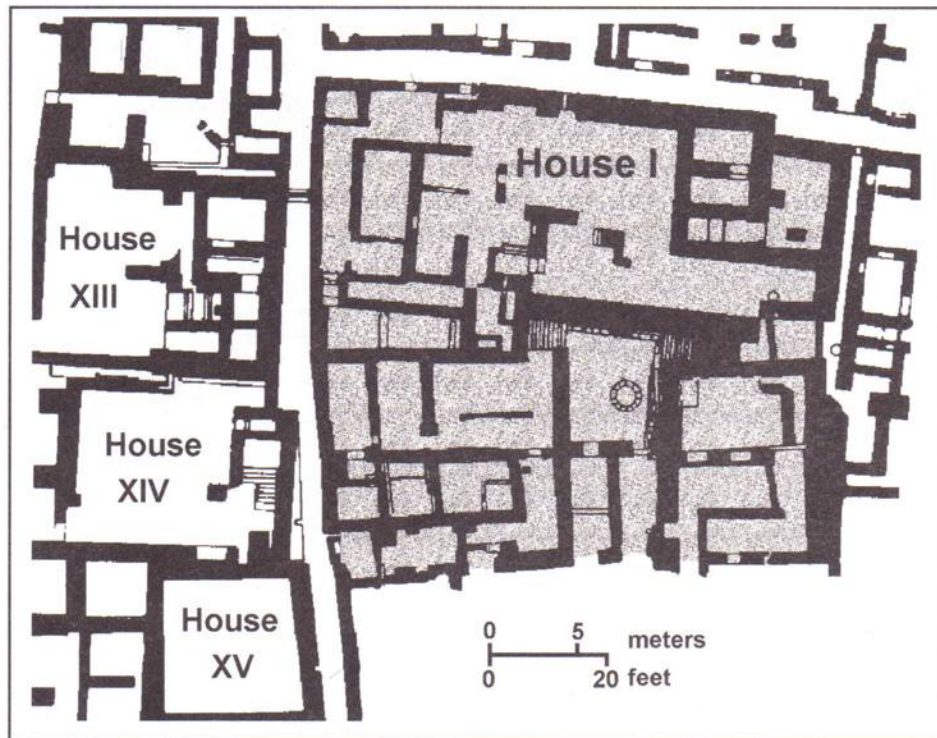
Mohenjodaro: House plans including the big house no. 1
